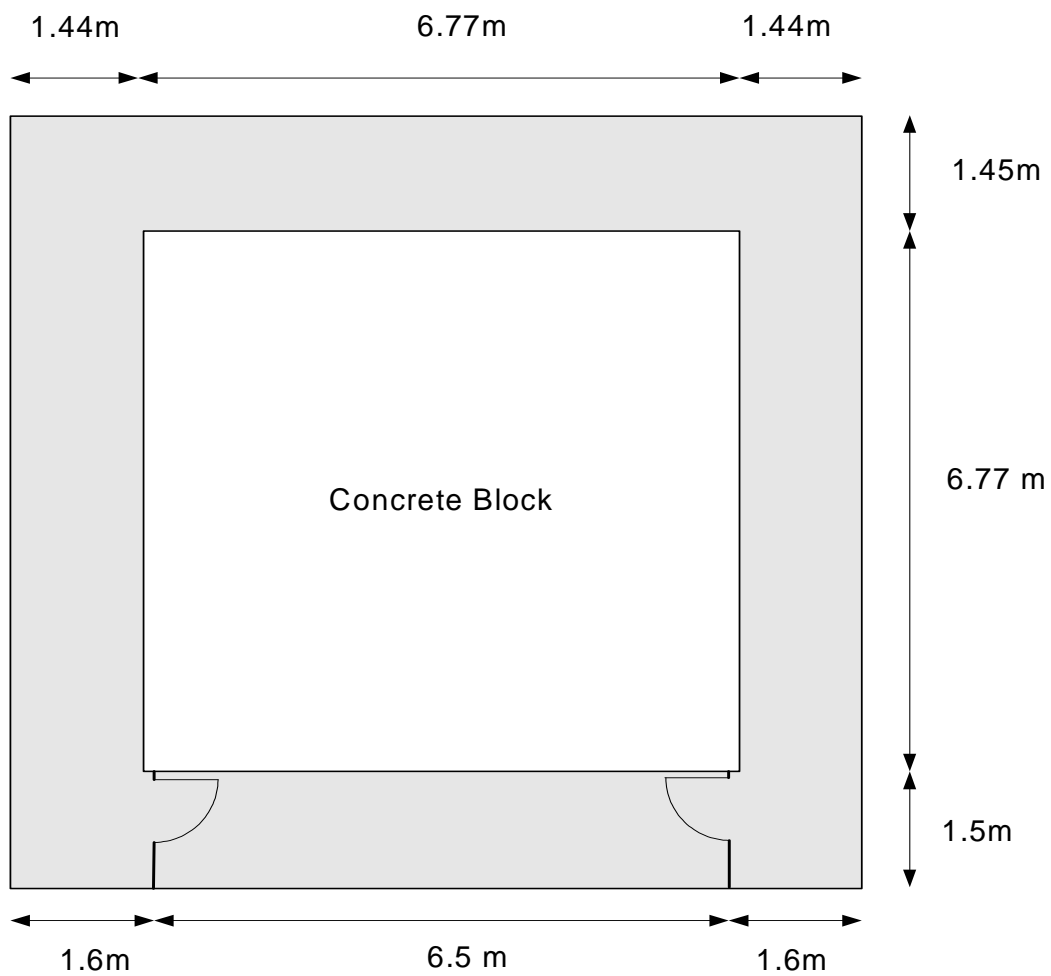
The floor plane of the 8th floor of School of Engineering.
